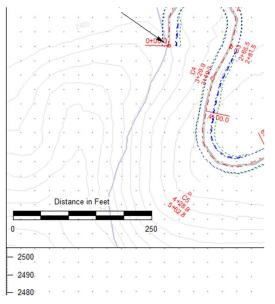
Scale Bar in Lower Left Corner of Plan Sub-View
